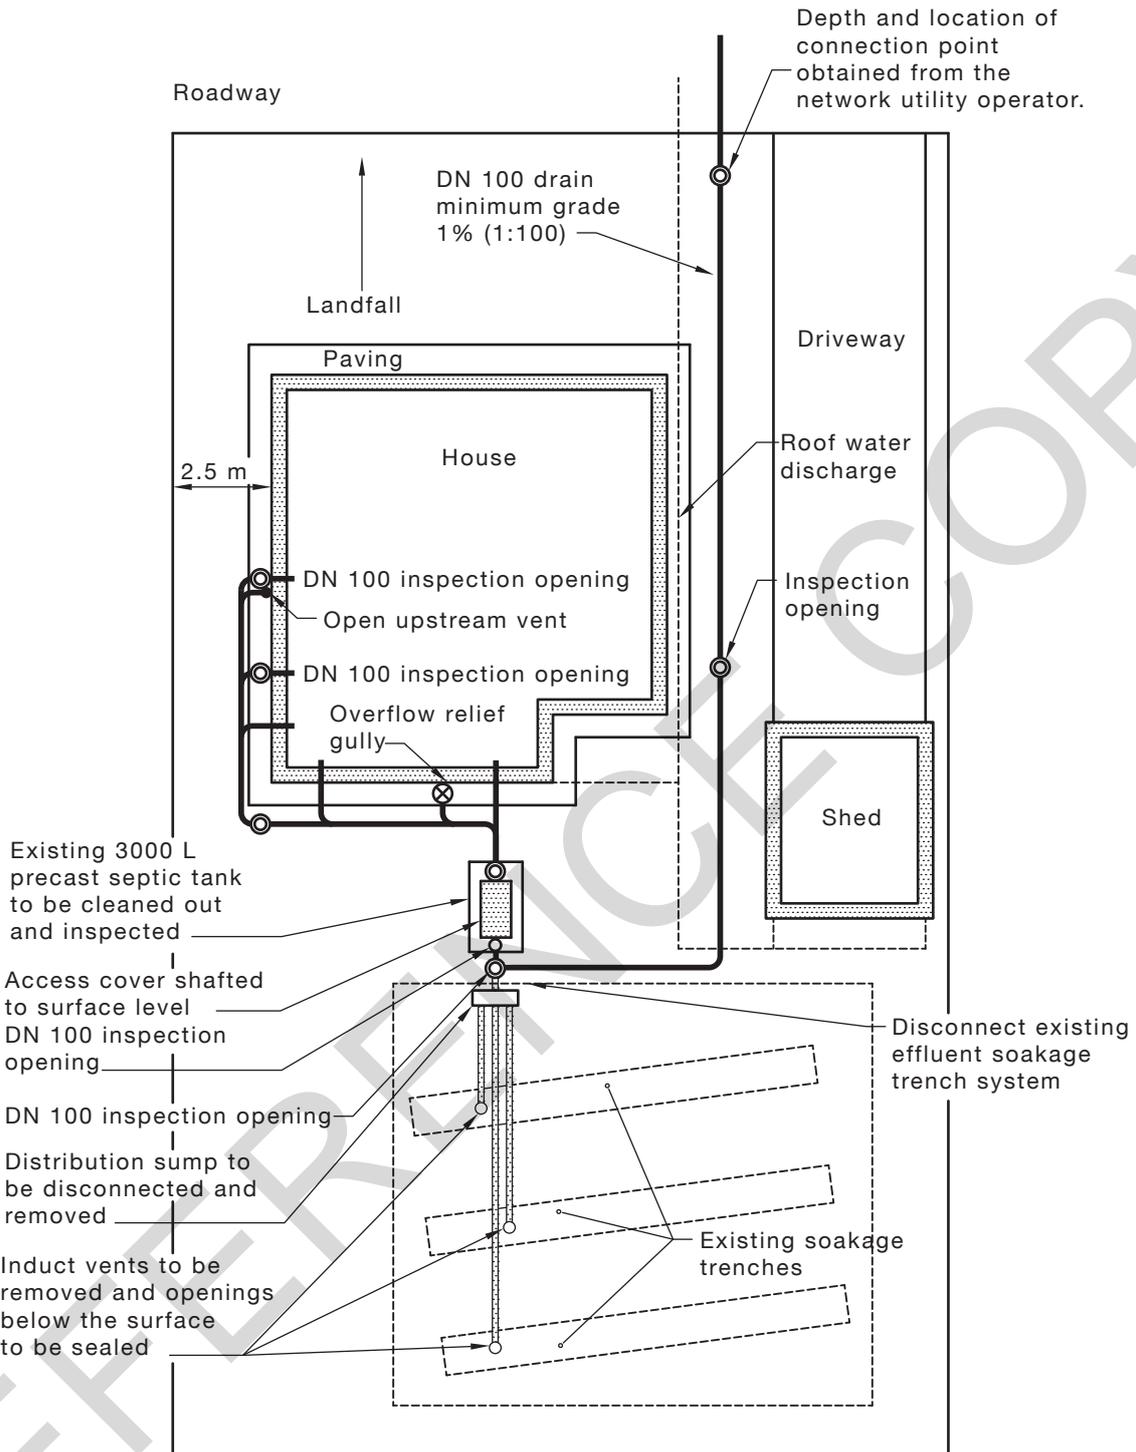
(A) TYPICAL SITE LAYOUT PLAN SHOWING CONNECTION DETAILS FOR AN ALL-WASTE SEPTIC TANK SYSTEM
